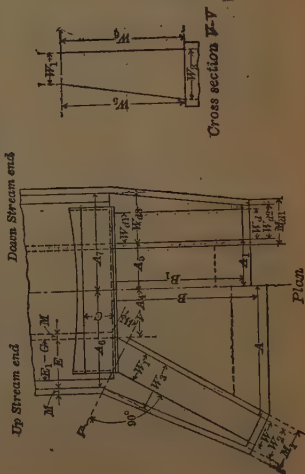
Standard Plain Concrete Arch Culverts, Erie Railroad
